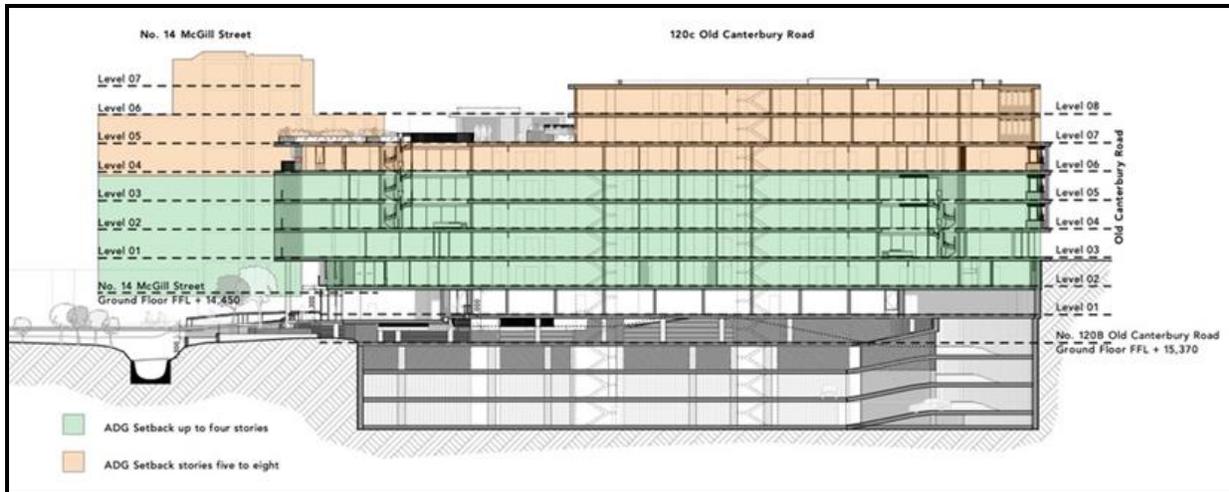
Blanket Diagrams illustrating floor levels and ADG building separation requirements
